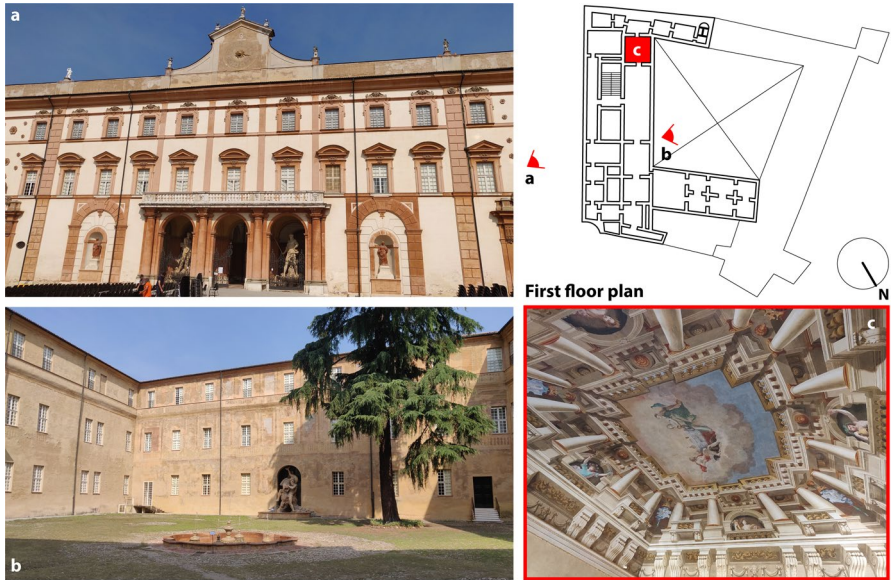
a The main palace façade; b the inner courtyard; c plan locating the Camera di Giove; the vault of the Camera di Giove
